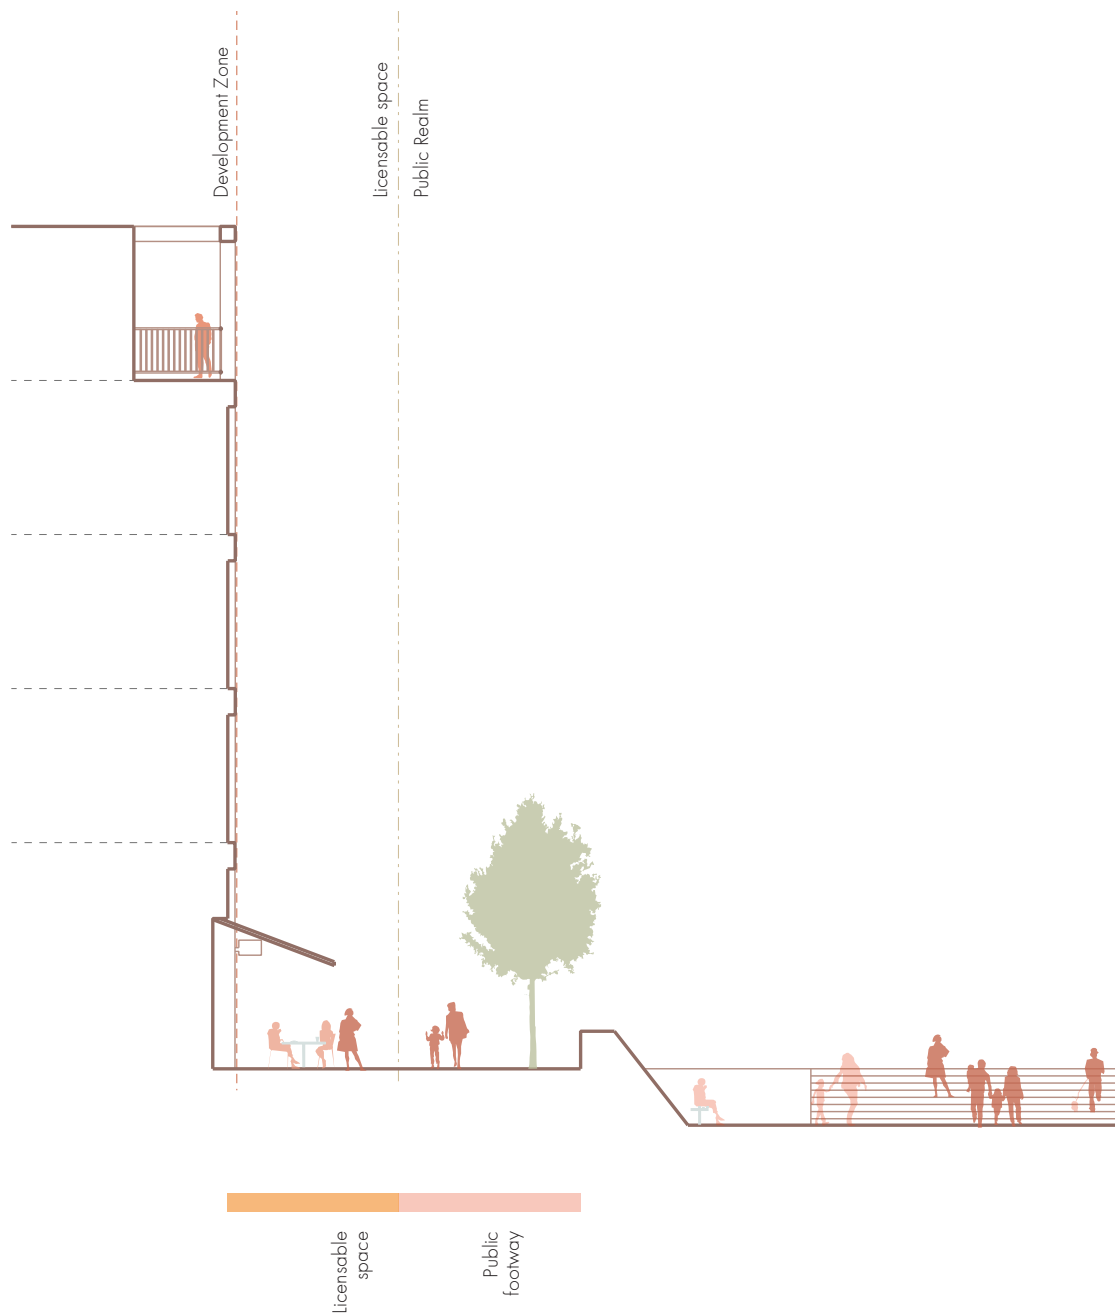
Illustrative section showing pedestrian boulevard adjacent to the Coal Drops
